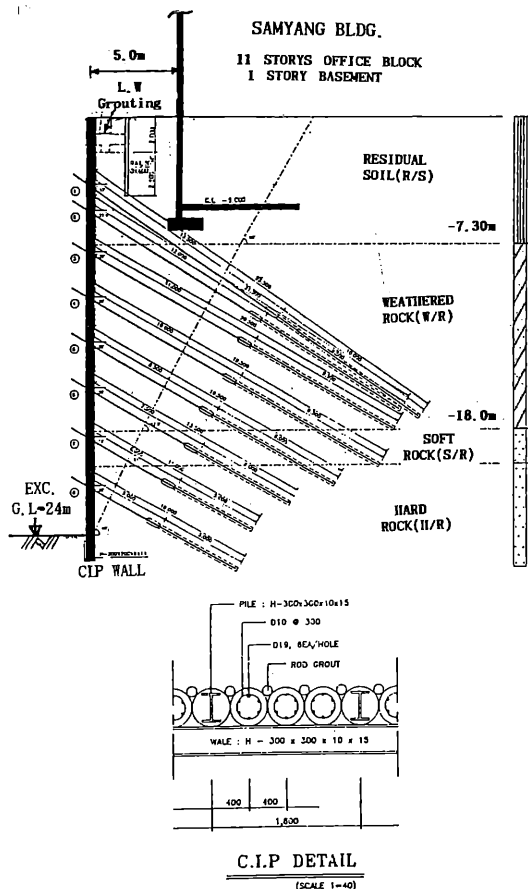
Section through CIP Wall on SAMYANG BLDG. Side
